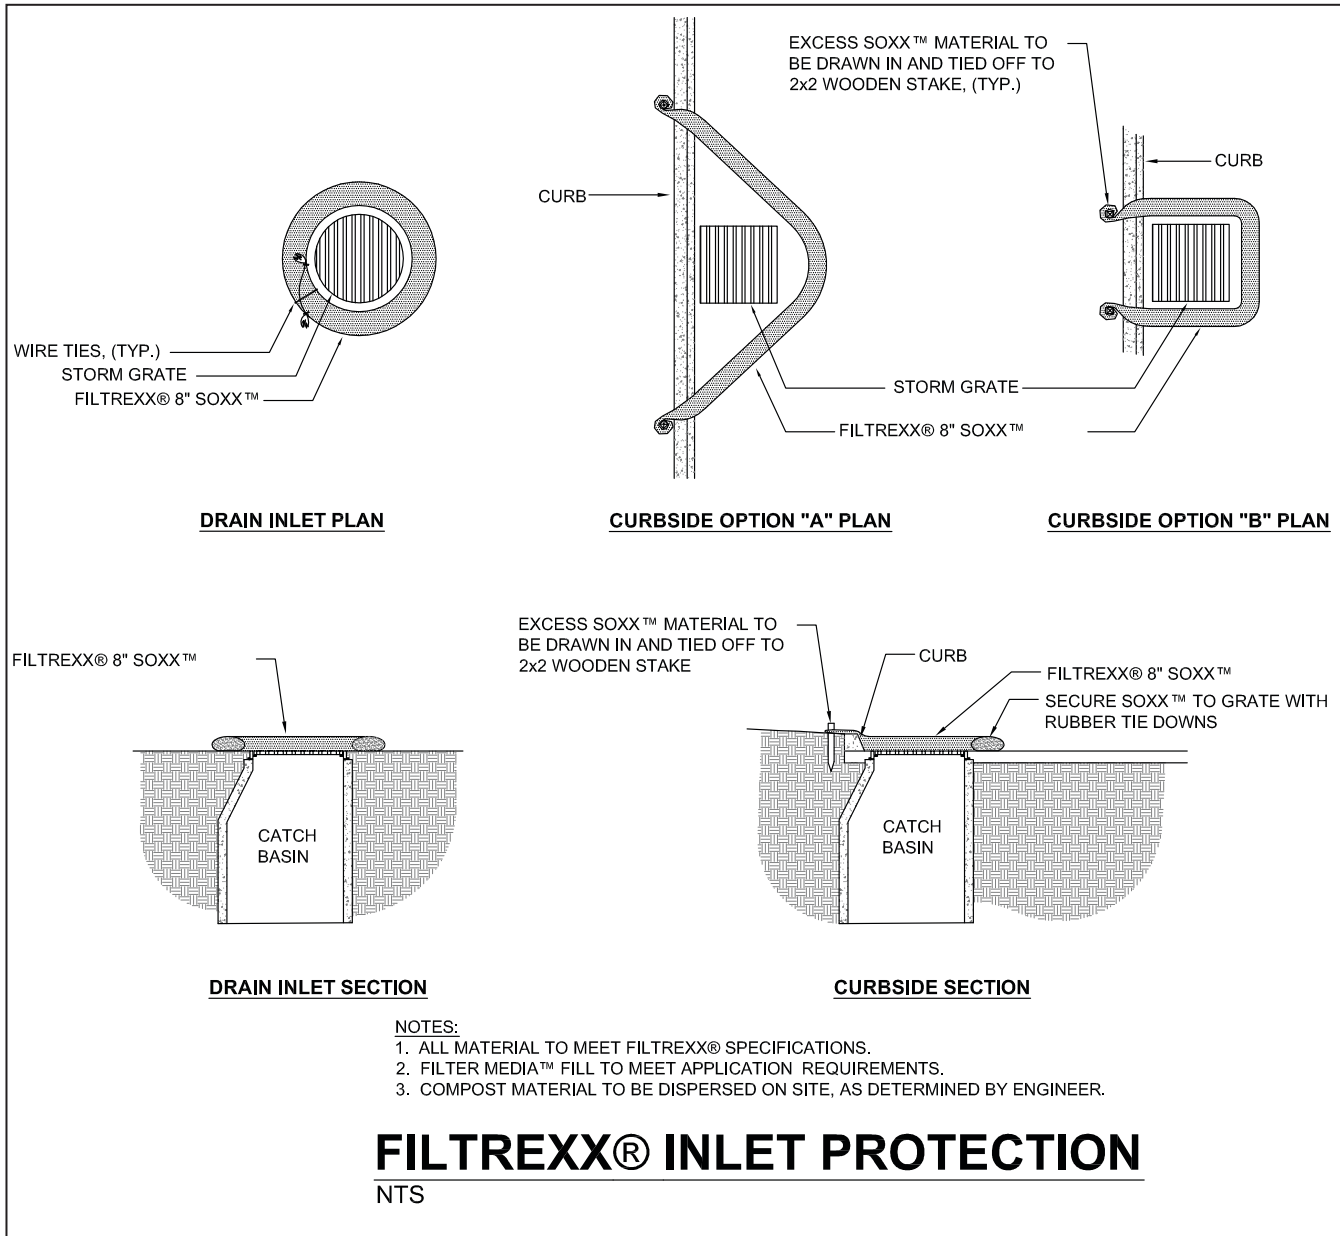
Engineering Design Drawing for Curb Sediment Containment Inlet Protection
